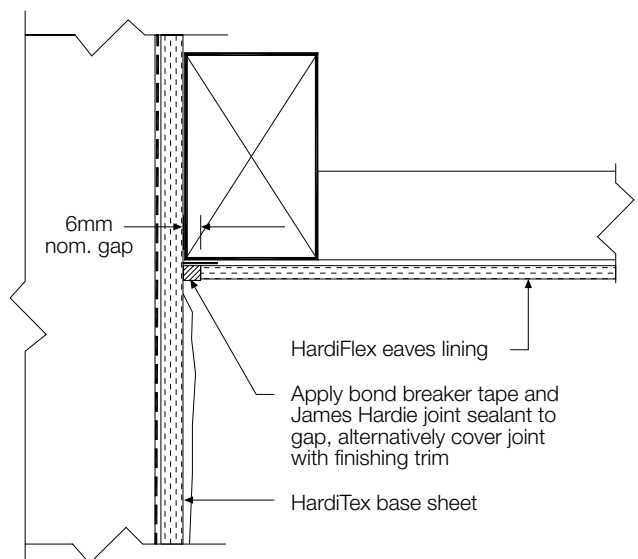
HARDITEX BASE SHEET CONTINUES PAST EAVES LINING
